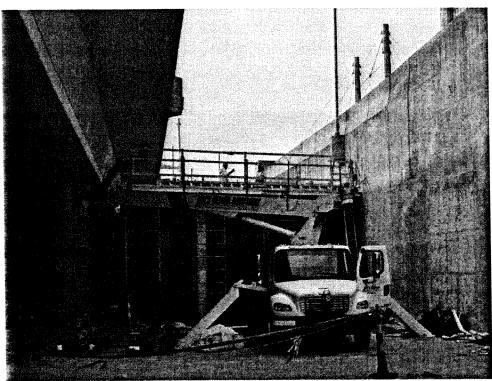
TPSS #2 platform under construction in the Riverfront Transit Center
